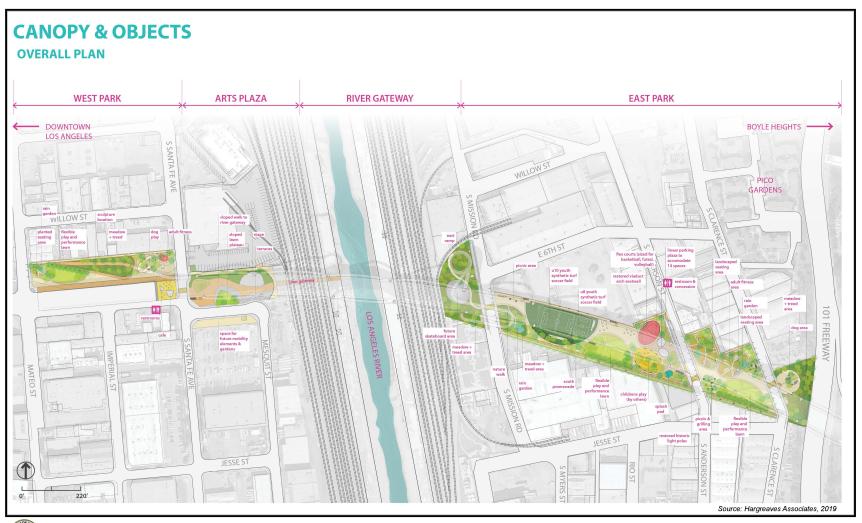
PROJECT SITE Sixth Street PARC Project
